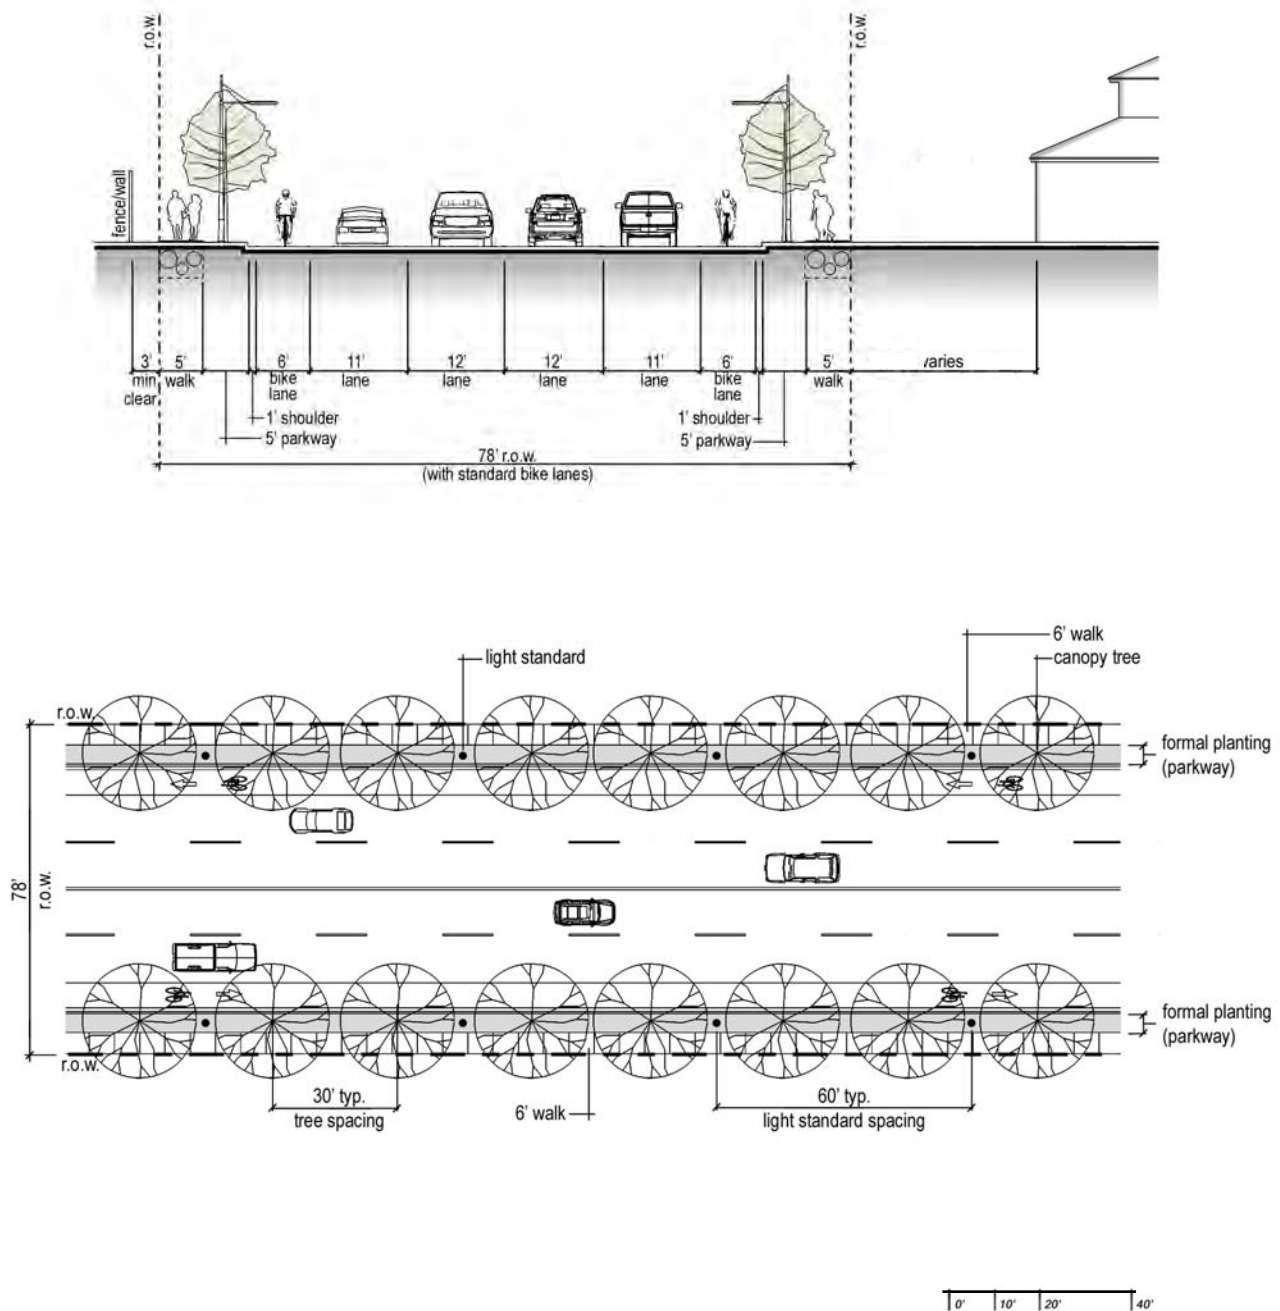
Typical Collector Section & Plan: Major Collector
